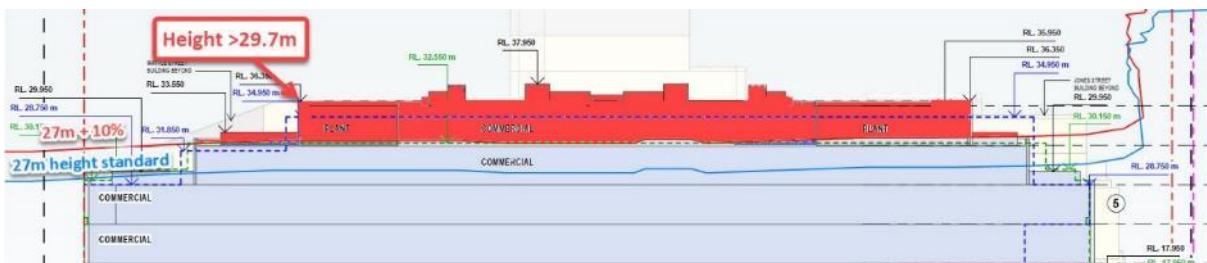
Building E - Fig Street Section Detail: Height >29.7m (Sydney LEP 2012, cl. 6.21D)
